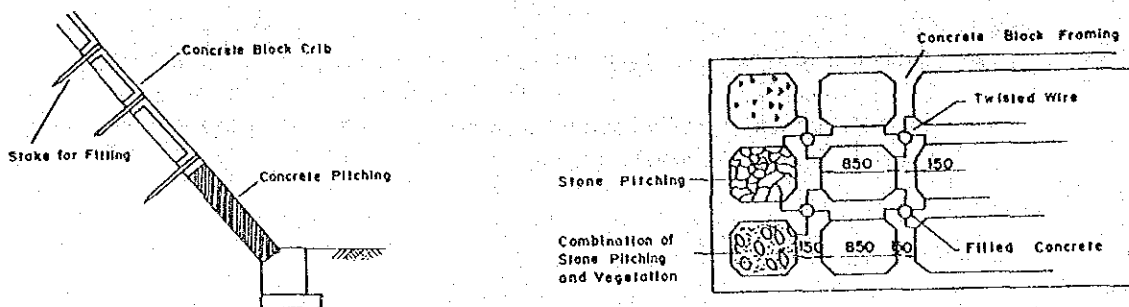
CONCRETE BLOCK CRIB
